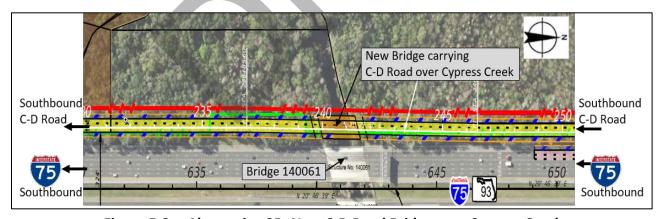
Alternative 2B-New C-D Road Bridge over Cypress Creek
